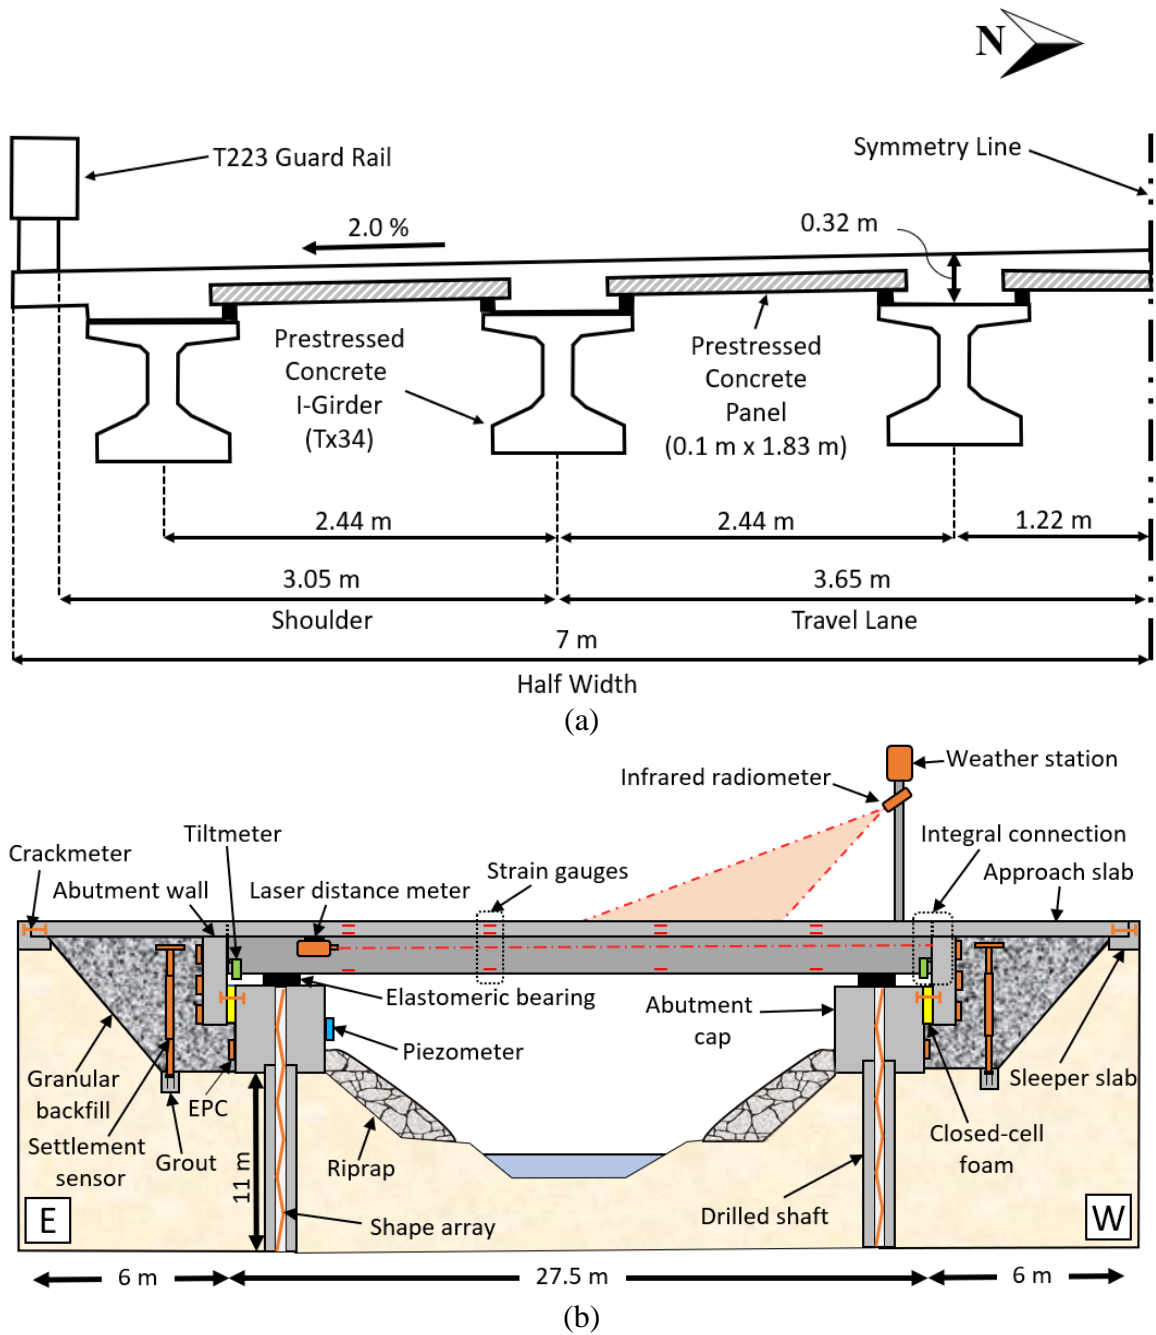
Schematic of China Creek Semi-integral Bridge: (a) Transverse cross-section (half-deck); and (b) Longitudinal cross-section showing the location of installed sensors. (EPC: Earth Pressure Cell)
